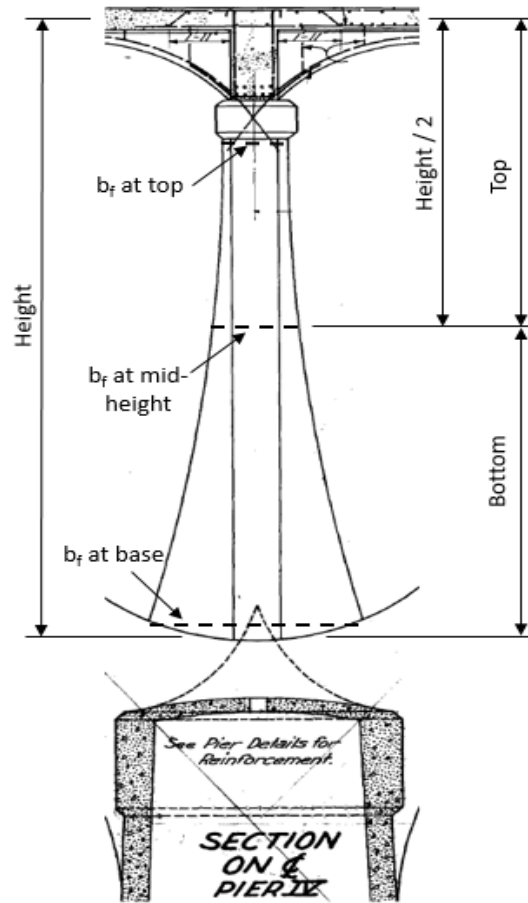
Elevation of Column 3 with Labels (AHD 1929)
